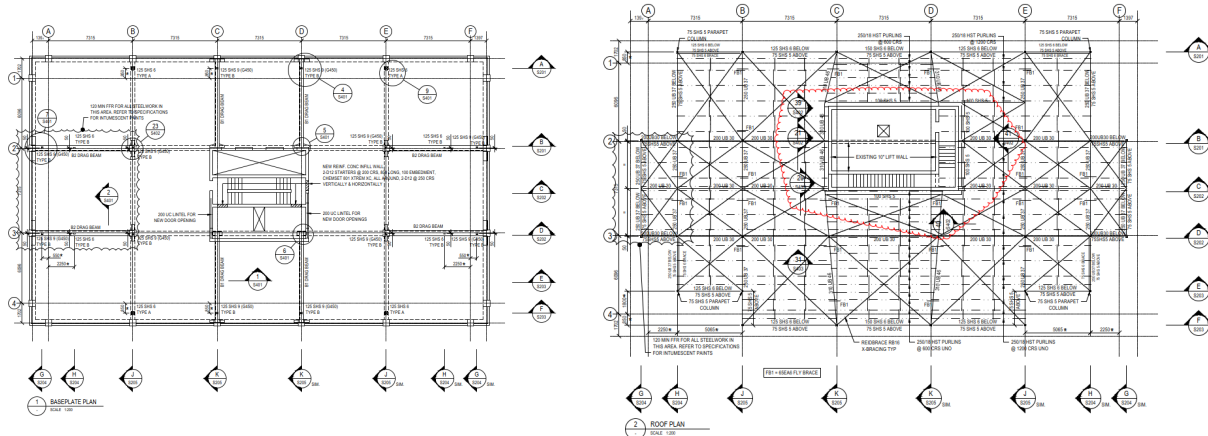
Existing top floor (left) showing the new drag beams and new roof layout (right)
